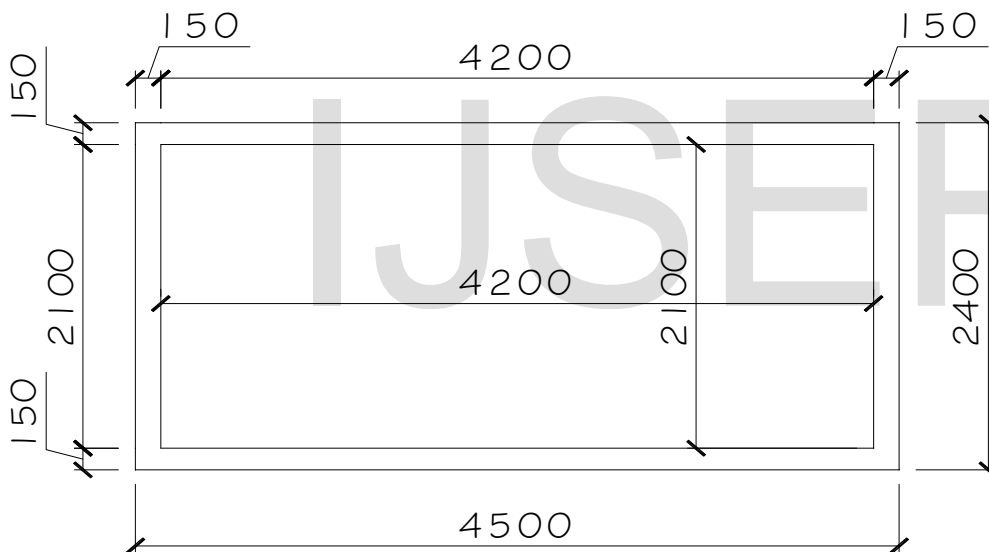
Rectangular Concrete Channel Cross Section in Millimetre (mm).
